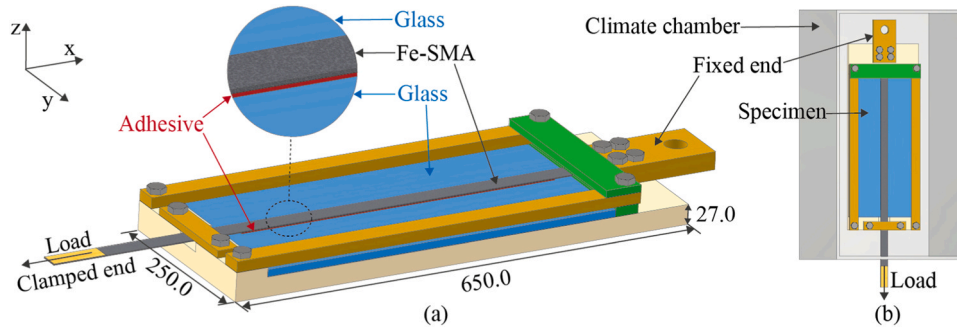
Detailed test setup with the specimen (a), lap-shear test setup configuration in the climate chamber (b) – provided dimensions in [mm].
